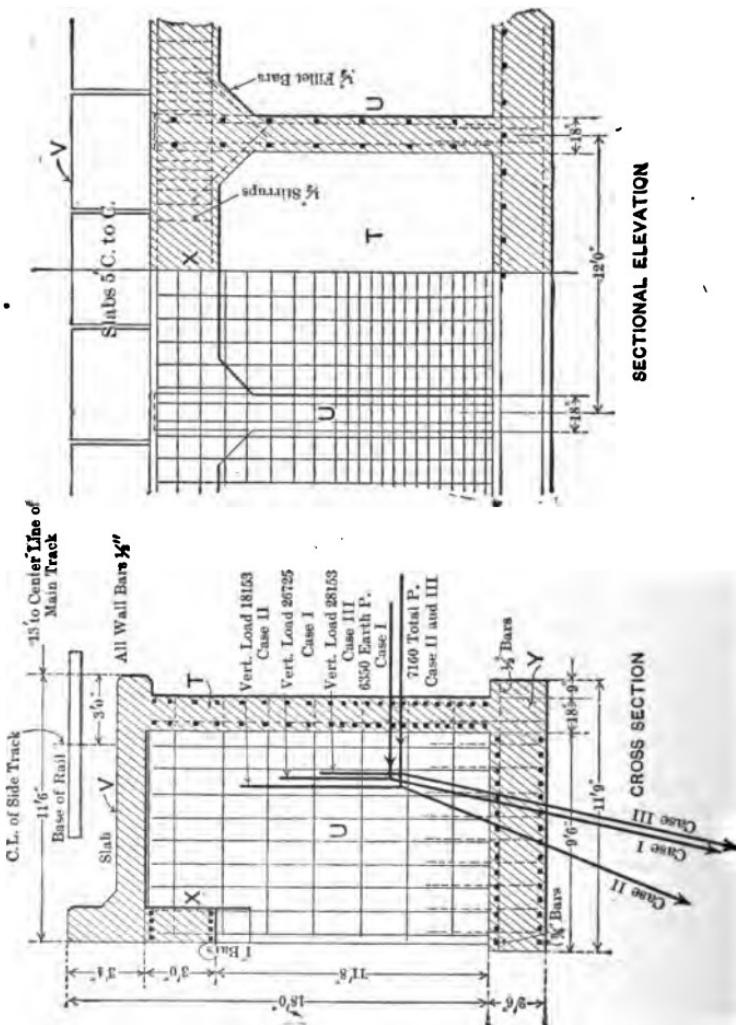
Reinforced-concrete Retaining Wall with Outside Buttresses and Slab Deck.
